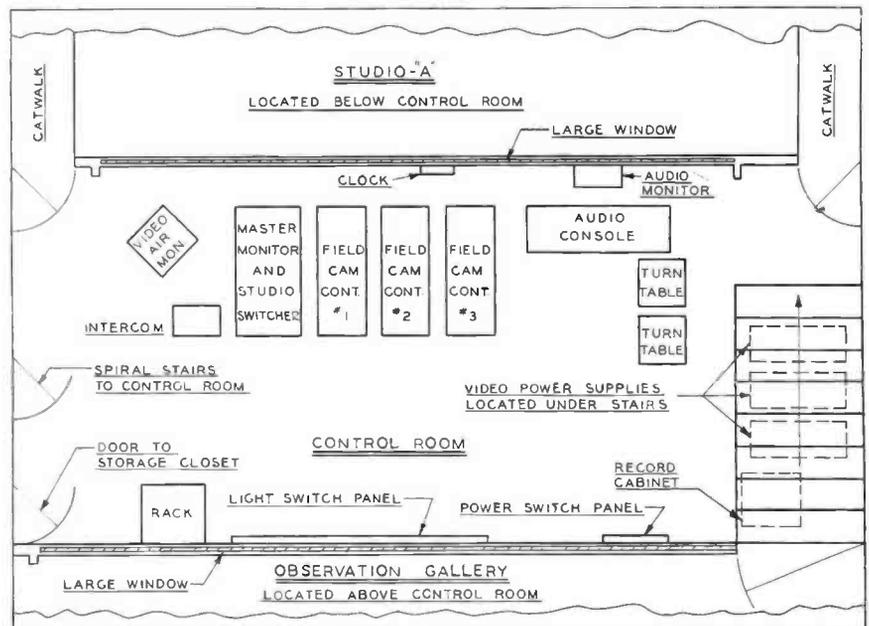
Floor plan of Control Room A showing location of equipment units. The observation gallery, which is a half floor above the control room, provides a view through the control room into the studio.
